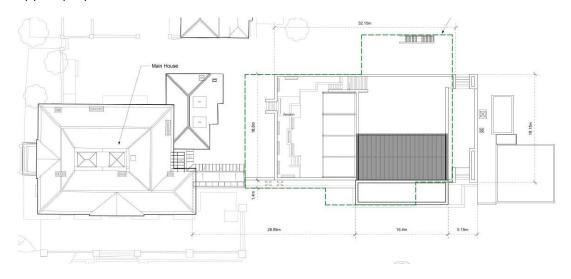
As proposed site plan with the approved 2014 footprint in the green dotted line.
